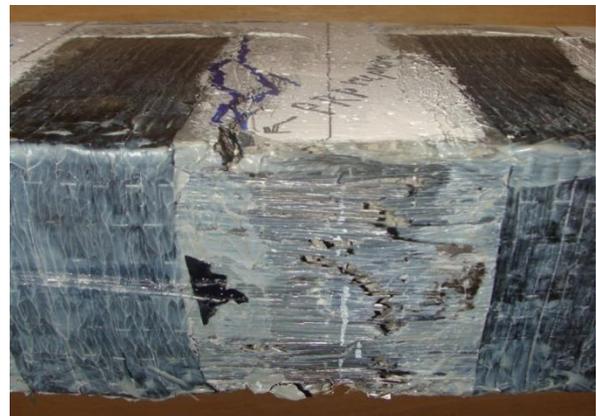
Close view showing sudden rupture of CFRP sheet of tested beam A3-S12
